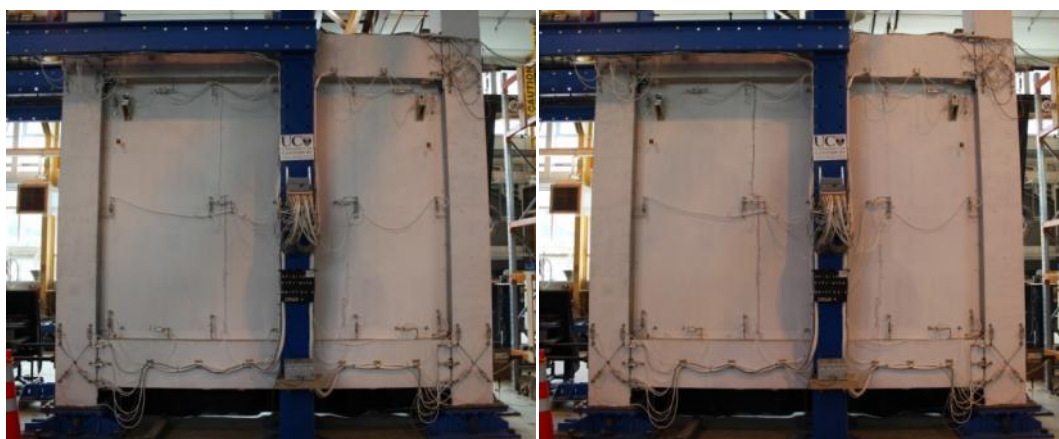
As built steel framed drywall specimen FIF1-STFD after the finishing
